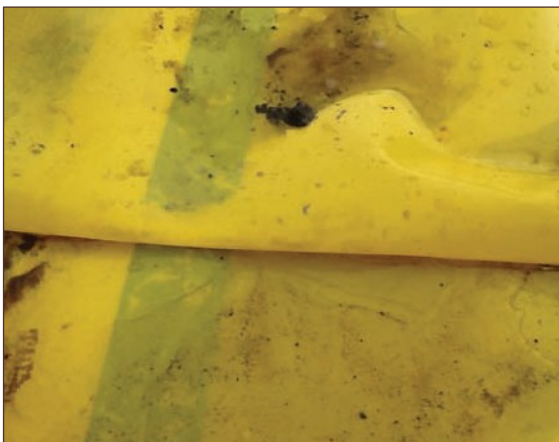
Tape joint with crease running through and air bubbles where gas membrane not in complete contact with tape. Rollers should have been used to produce a consistent seal (courtesy MEC Environmental Ltd)
